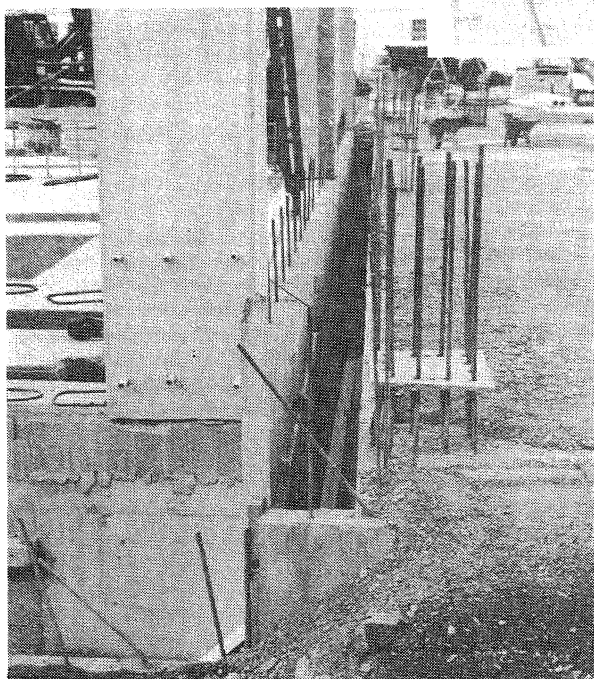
CLEARANCE AROUND BUILDING UNDER CONSTRUCTION FOR WELLINGTON NEWSPAPERS LTD.
